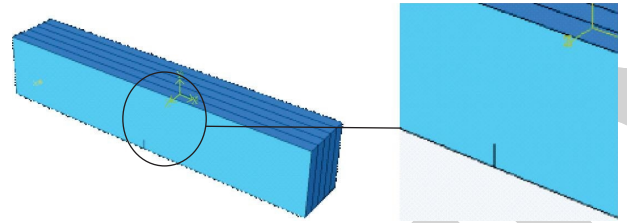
Asphalt concrete pavement beam model with initial reflection cracks ( $a = 15$  mm).
